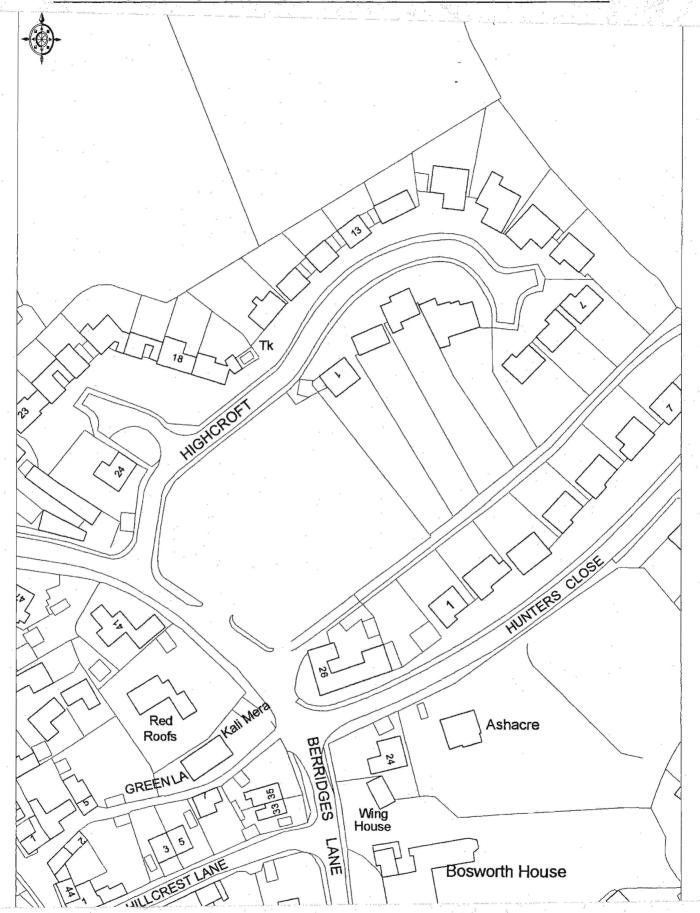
Site Location Plan of the development area. Scale 1:1250.
